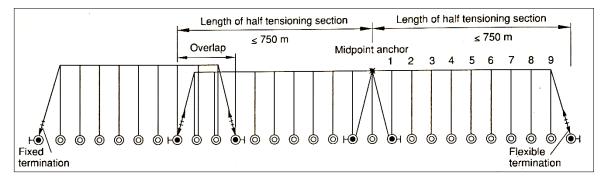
Layout of a tensioning section with corresponding components. (Kiessling 2009)
